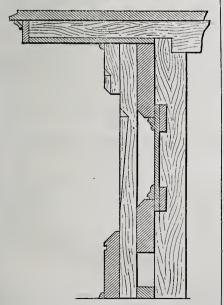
Section Through Counter.--Scale I Inch to the Foot.
